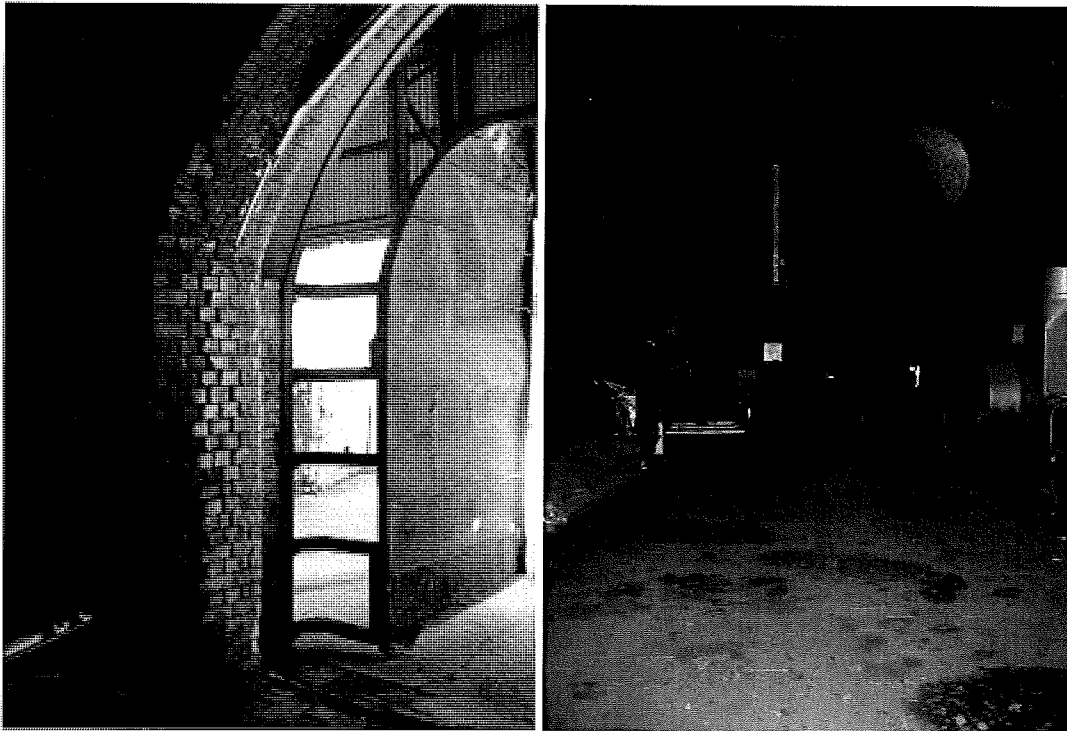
From left: interior of kiln showing entry and deteriorating fire bricks; interior of kiln showing later cement paving.
